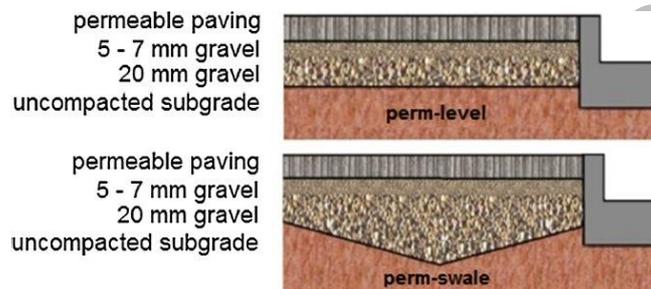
Experimental pervious pavements had gravel bases formed of 20 mm gravel 150 mm thick on level subgrade (perm-level) and formed as a gravel-filled swale 300mm deep at the centre (perm-swale).
